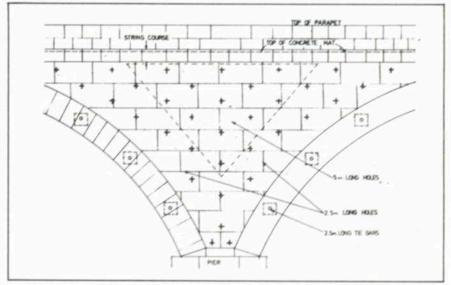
Arrangement of grout holes for Spandrel Walls, Kincardine Viaduct
